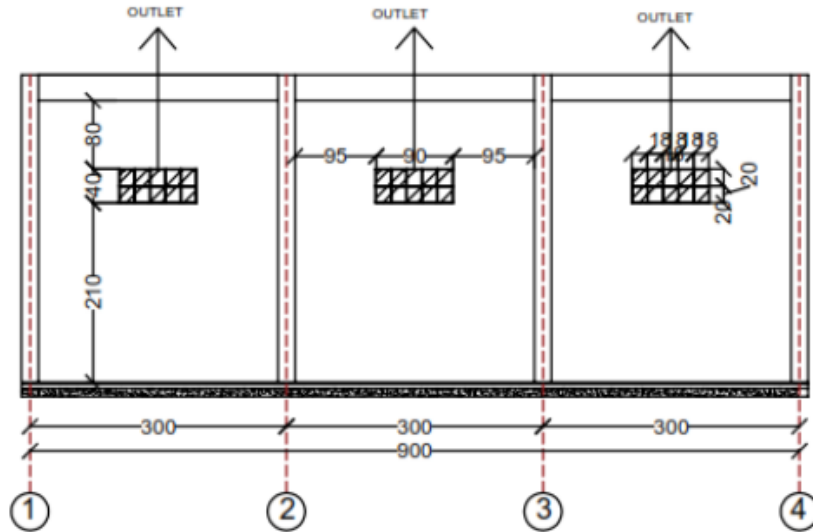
Experiment Classroom model with adding outlet/opening.
